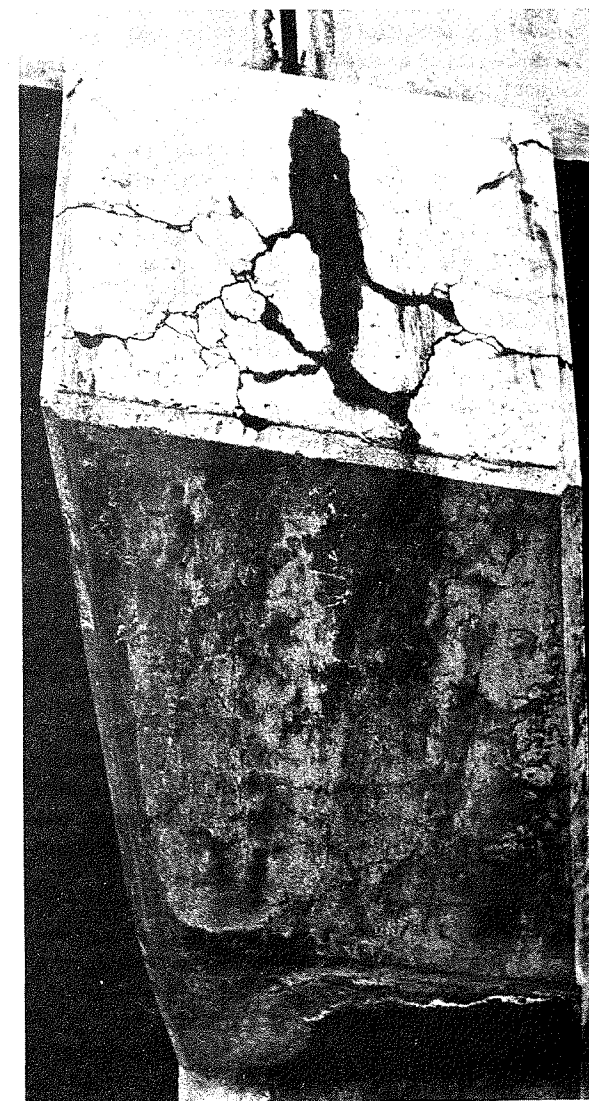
Cracked transom beam of Stellenbosch-Klapmuts road bridge (R44) over N1.
